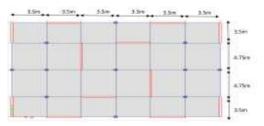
Plan of Building with 1.5% Shear Wall Ration in Each Direction
